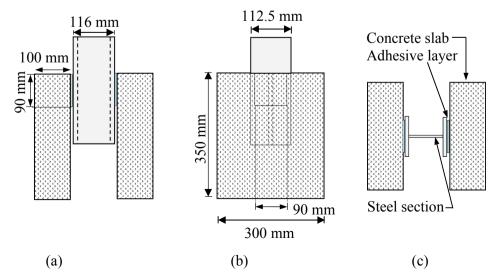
Geometric detail of steel-concrete composite push-out test specimen bonded with structural adhesive; (a) front view, (b) side view, and (c) top view.
